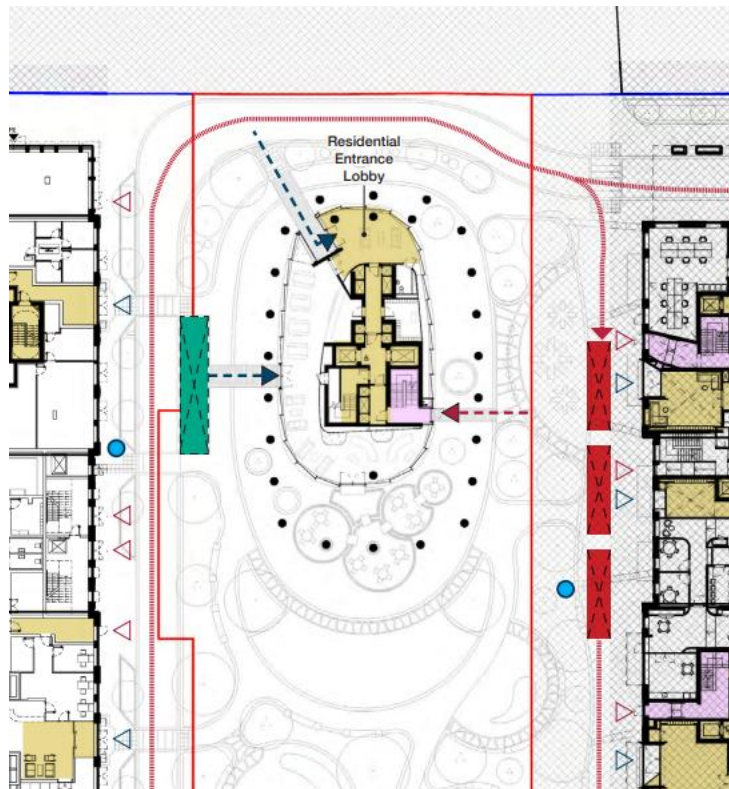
Plan showing the masterplan basement as approved. Phase 5 is edged in red
